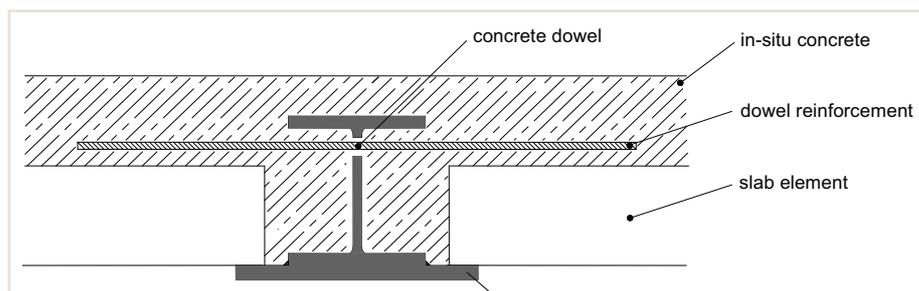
Slim-Floor Beam with concrete dowels, CoSFB
